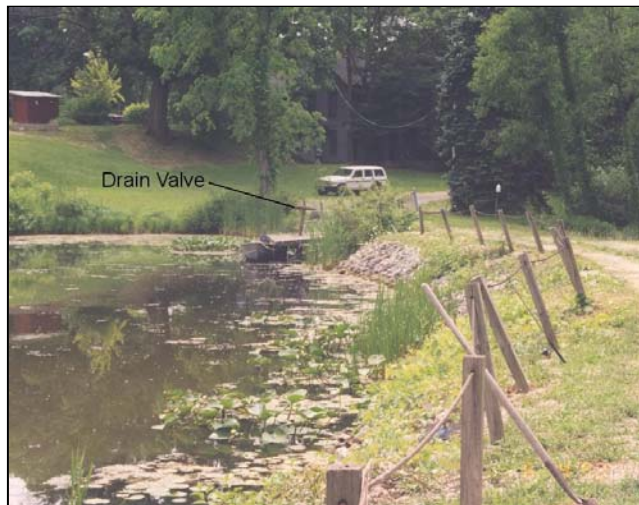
Outlet valve located under pier (not recommended) built over the riser. Figure 3.3b shows close-up of valve stem.
